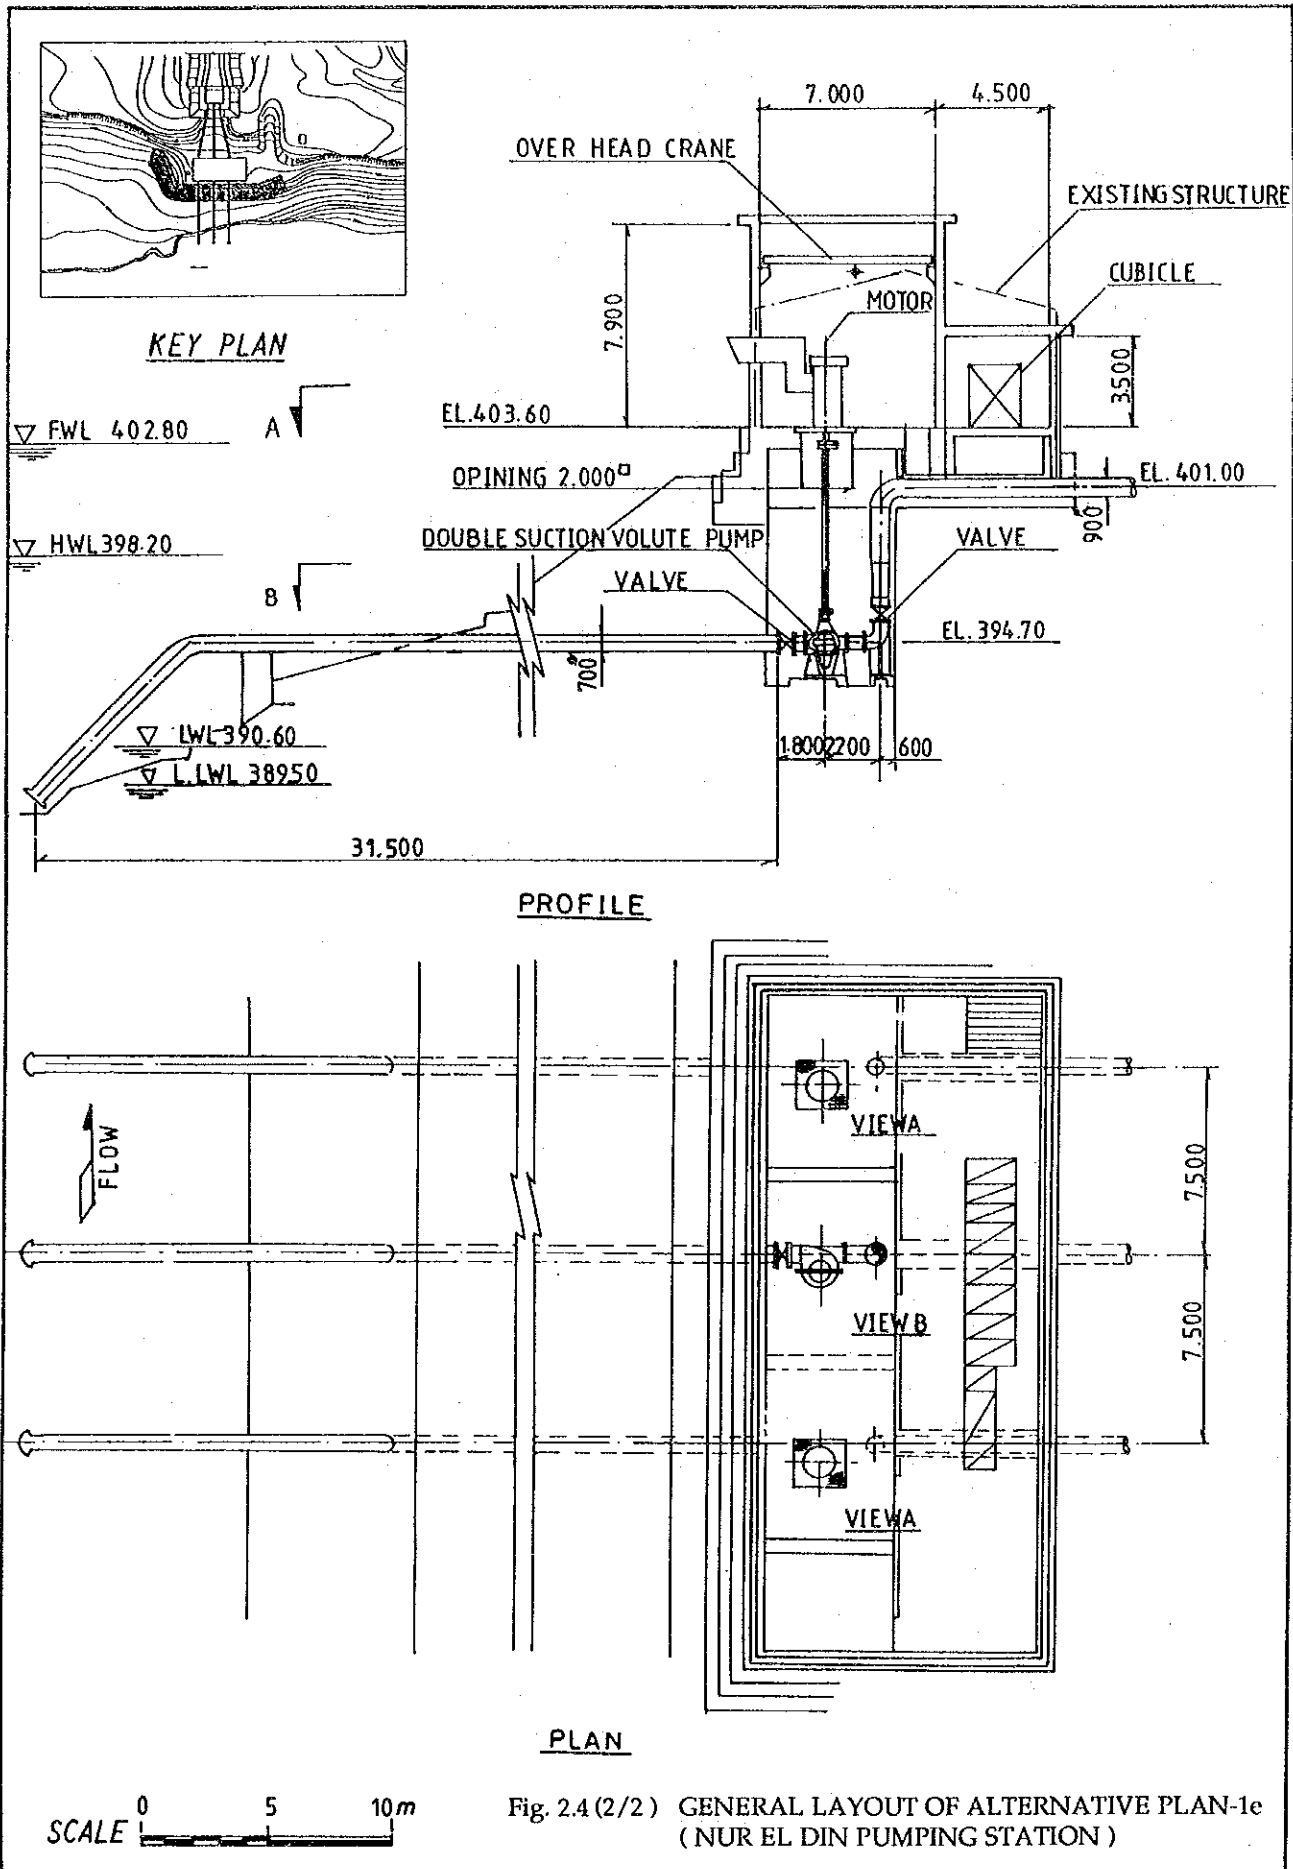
(2/2) GENERAL LAYOUT OF ALTERNATIVE PLAN-1c (NUR EL DIN PUMPING STATION)
